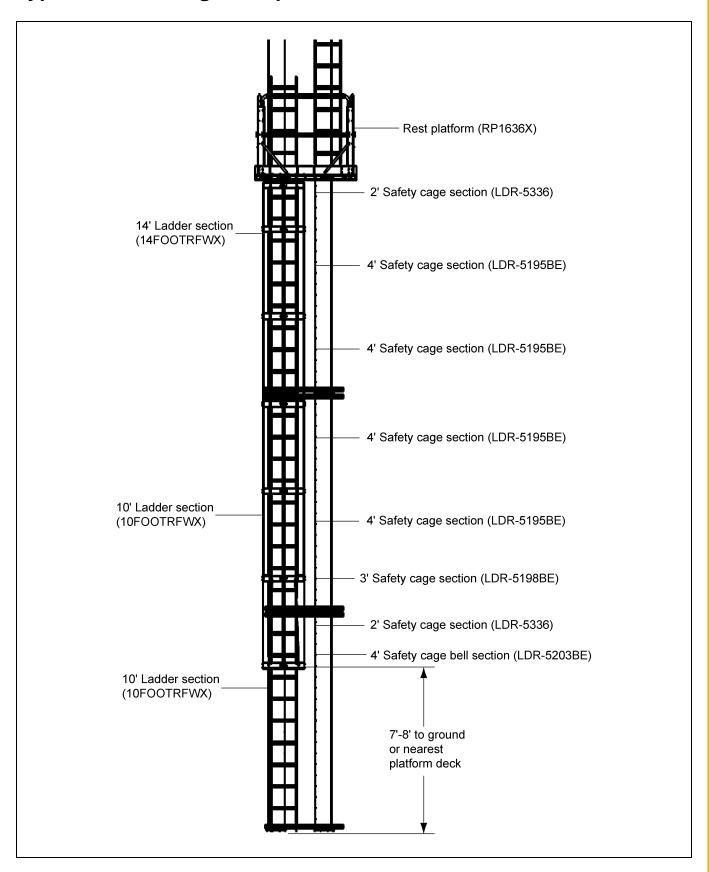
G Typical Ladder/Cage Assembly Layout (30' Shown.)
